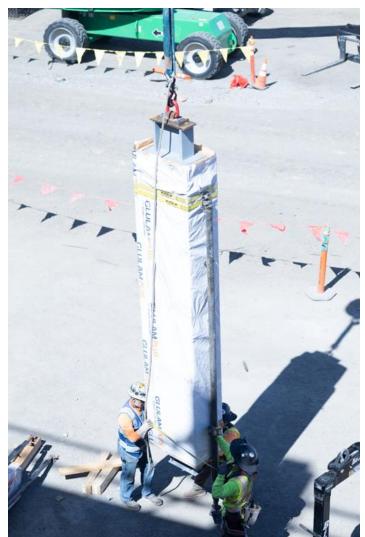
The Java offices utilised a proprietary steel connector to transfer vertical loads from column to column without crushing floor panels.
